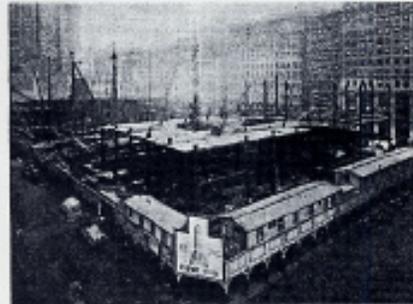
EARLY ERECTION VIEW OF EMPIRE STATE BUILDING
